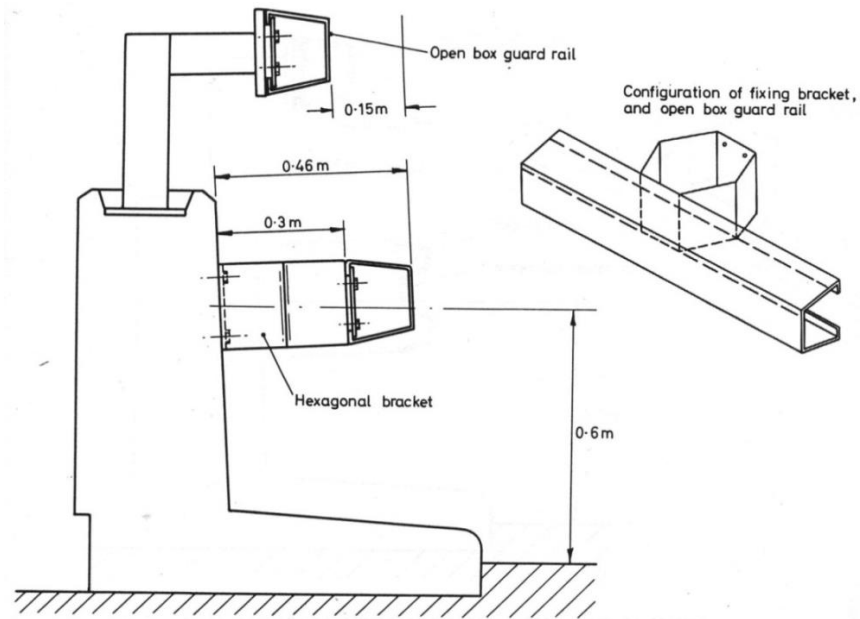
CROSS SECTION OF CONCRETE PARAPET FITTED WITH STEEL BRACKETS AND OPEN BOX GUARDRAIL
